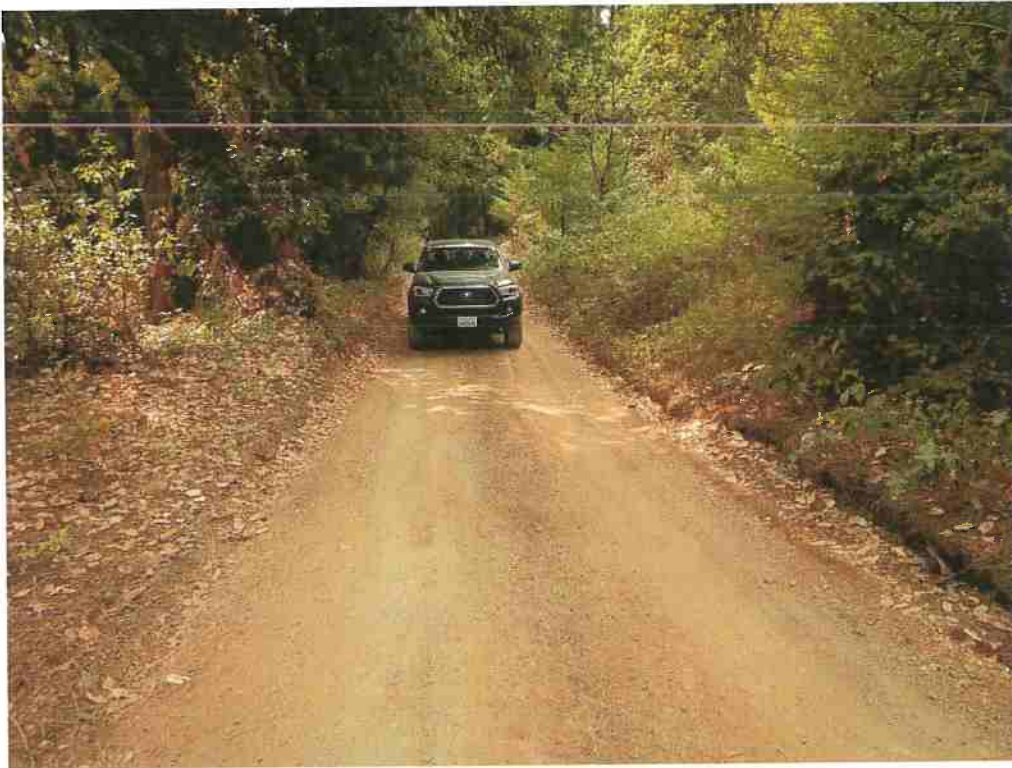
RP 9. Vehicle traveling north, photo taken facing south.
